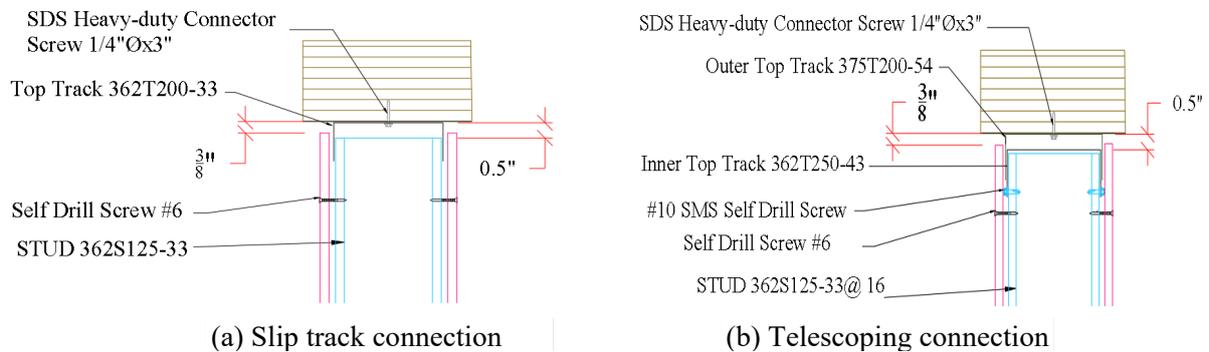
(a) Slip track and (b) telescoping connection detailing
